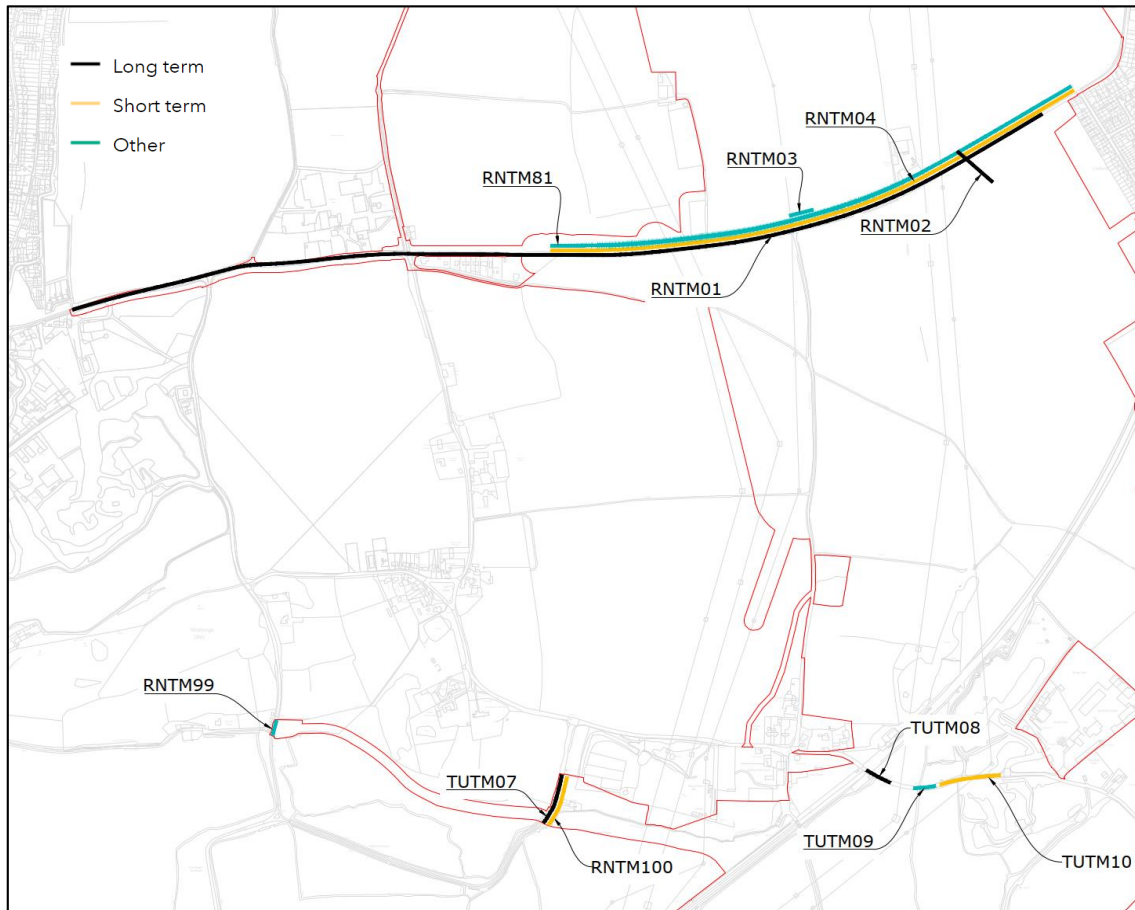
Roads North traffic management measures location plan (2 of 8)
